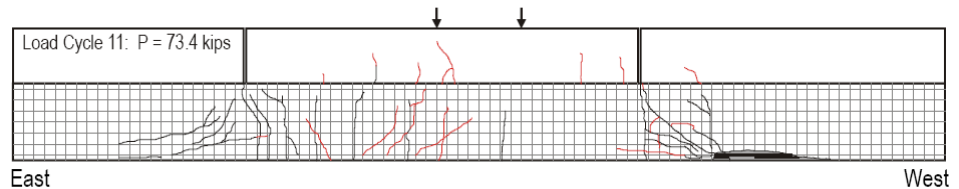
Laboratory Testing of Torsion-Shear Cracking Near Barrier Joints
